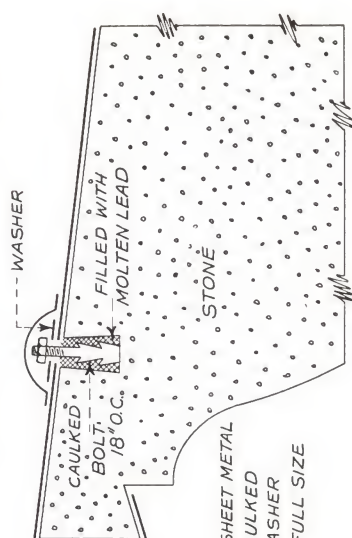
FASTENING SHEET METAL COVERING WITH CAULKED BOLT, NUT AND WASHER
